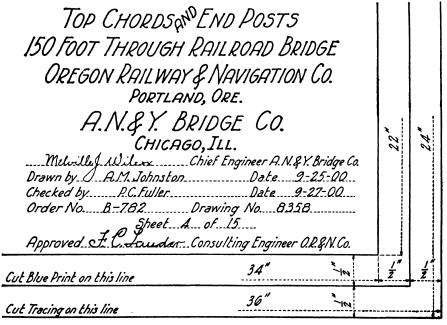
STANDARD SHEET AND TITLE FOR STRUCTURAL DRAWINGS.
